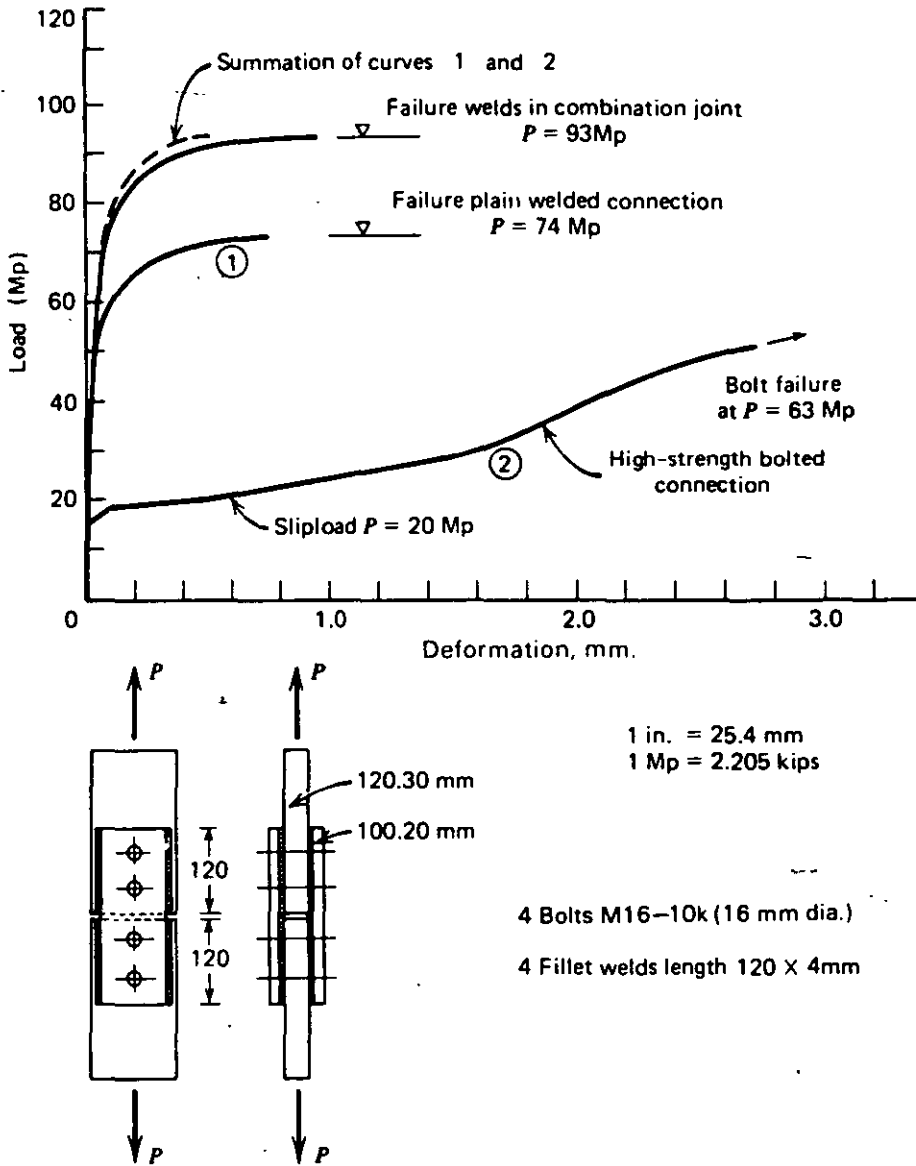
Test results of welded, bolted, and combined welded-bolted joints (Ref. 9.2).
